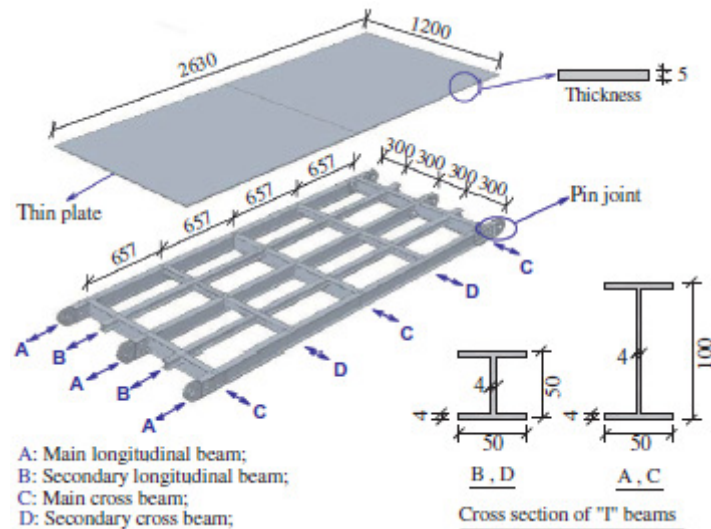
Configuration of the bridge and cross section of I beams (Zhang *et al.*, 2014)
